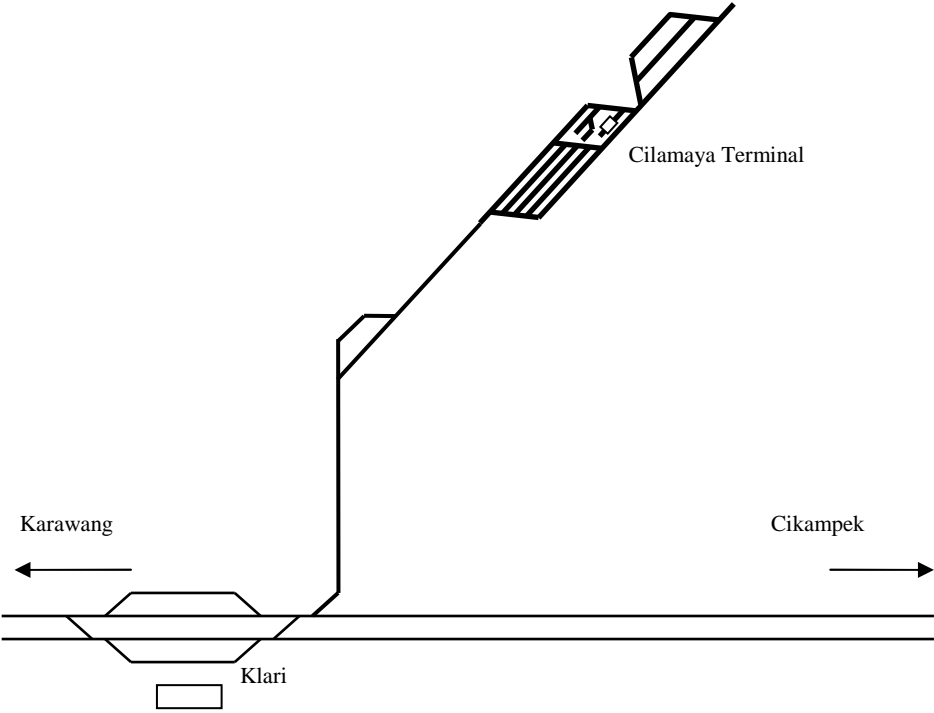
Track Layout (Railway Access to Cilamaya)
